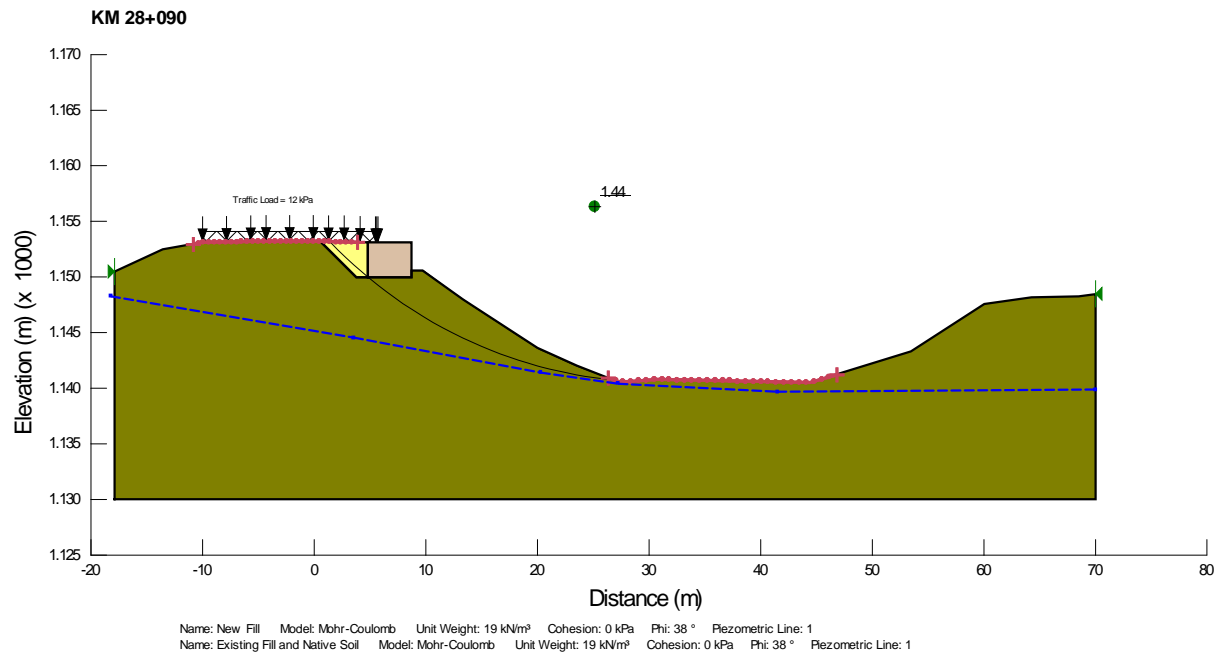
Station 28+090- Global Stability of the Slope after Construction of the Retaining Wall (Retaining Wall Height - 3.1 m, Wall Embedment below Finish Grade - 0.6 m, Reinforcement Length - 3.9 m)
